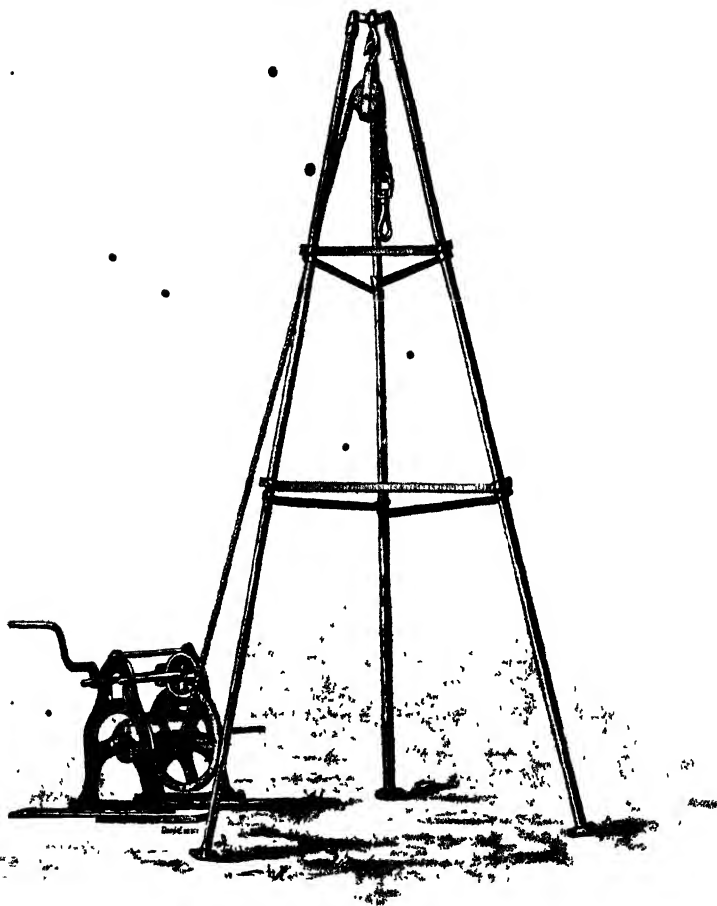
SHEER-LEGS AND CRAB-WINCH
